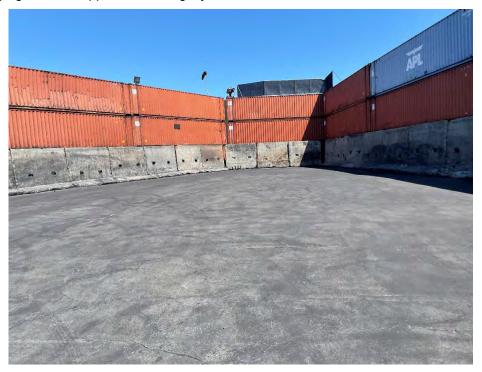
Looking north in the northern portion of the secondary bulk product storage area (SW-4). Seams and surficial cracking are visible.
